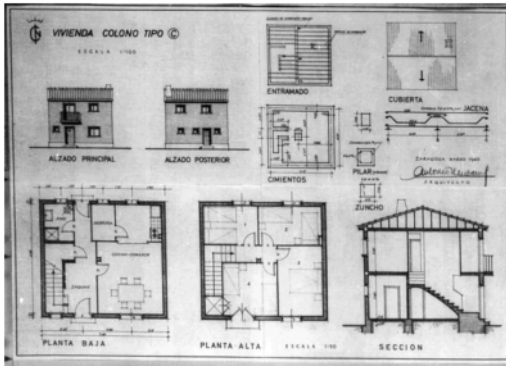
Project type of housing for a settler, with a reinforced concrete structure. This concrete plan belongs to the documentation of the village of Rada, although it appears in other locations as well. Source: INC archive. Architect: Eugenio Arraizo Vilella. 1954.
